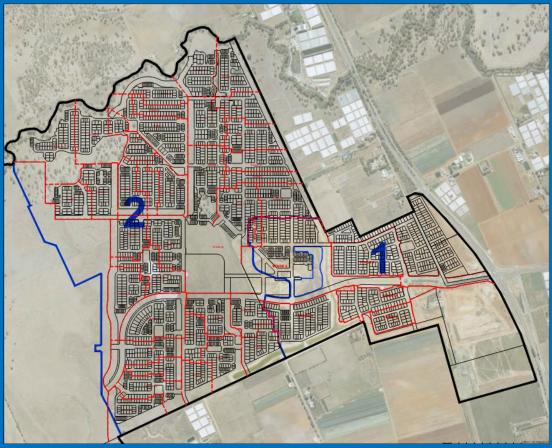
Precinct 2 (Approved Subdivision Layout Plan)
